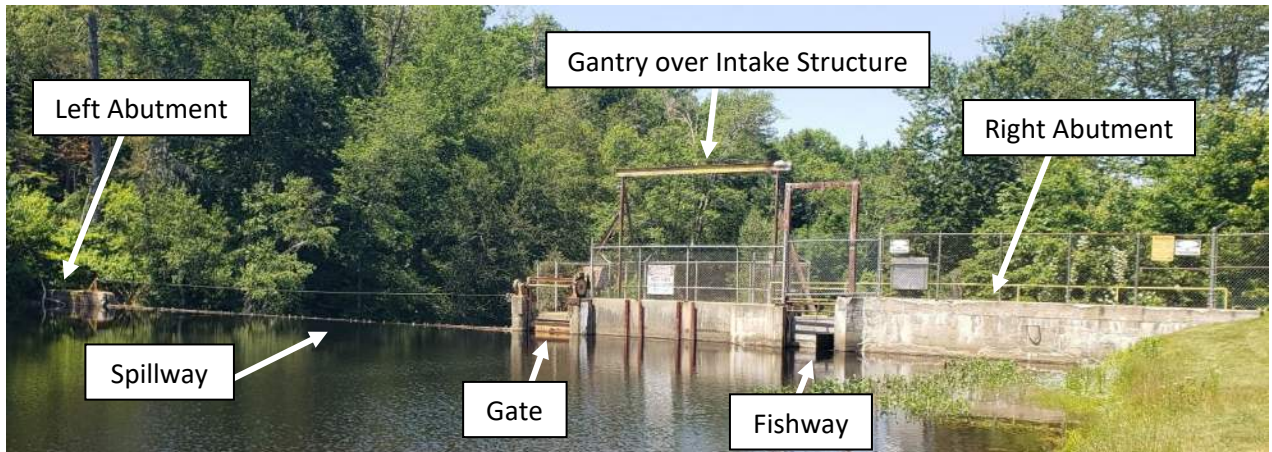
View of dam from right upstream shore, looking downstream.
